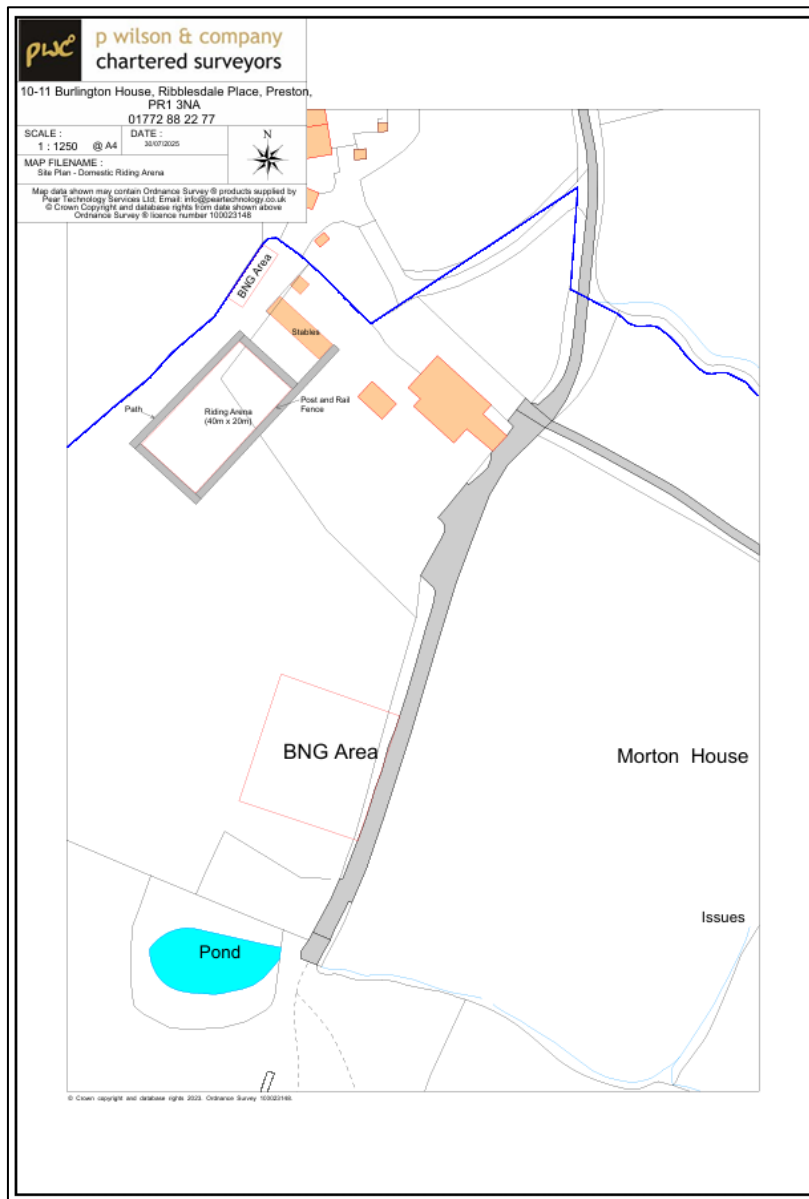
Proposed site plan (© P Wilson & Company)
